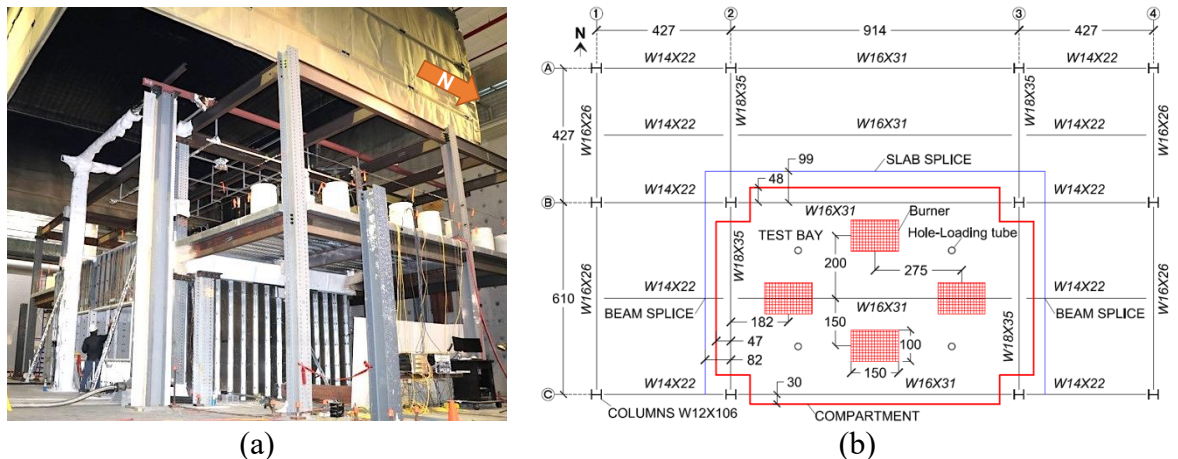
(a) Photograph of the two-story test frame and (b) scale drawing of floor plan. Units are in cm.
